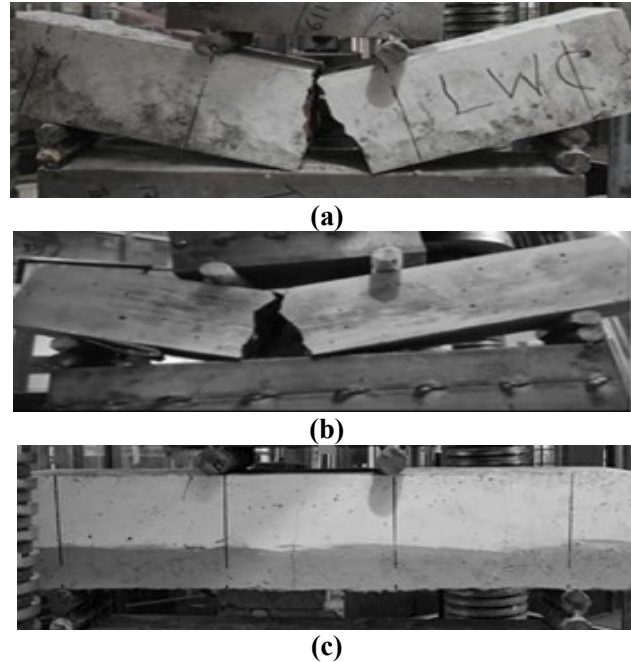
Crack pattern (a) LWC beam (b) NWC beam (c) ECC-T beam
